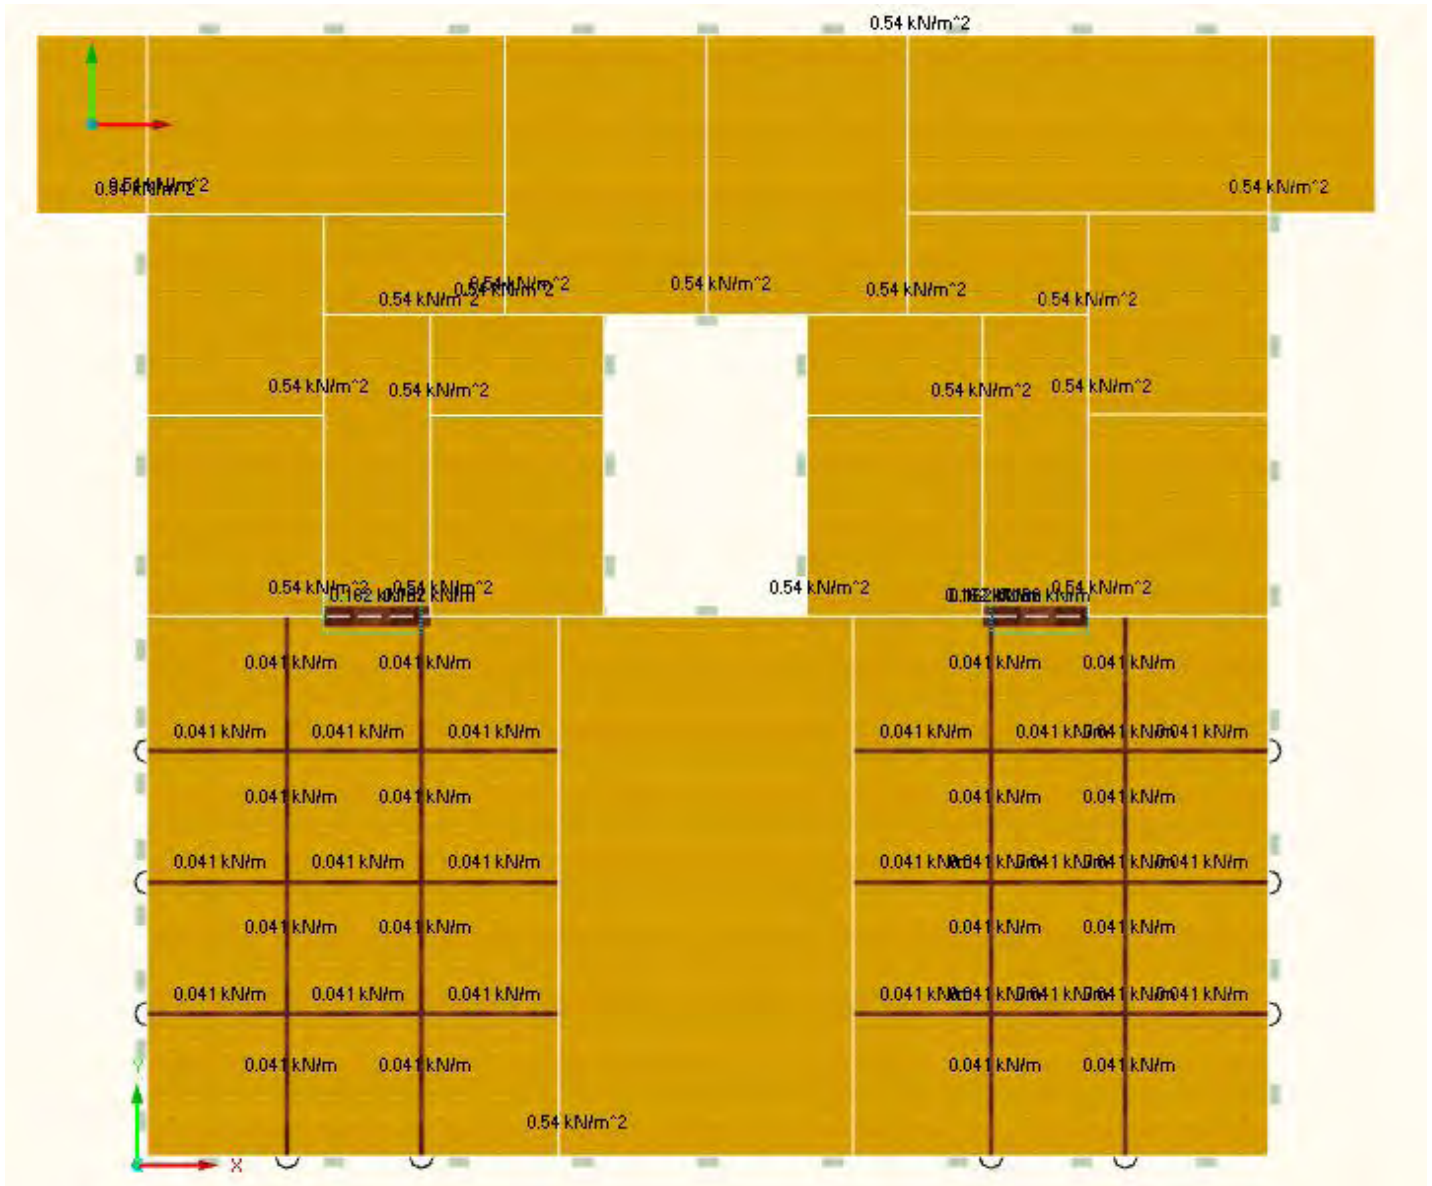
Assign of Suction Wind Load on Typical Floor (KN-M Units)
